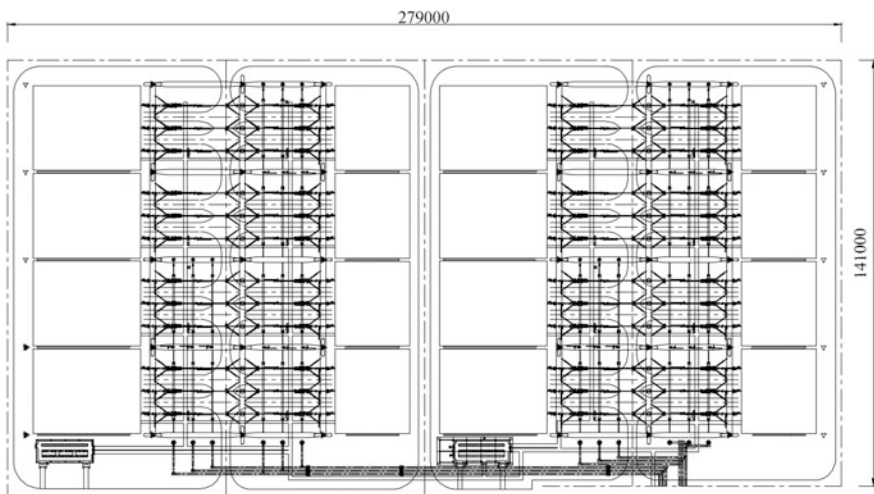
Typical improved checkerboard-pattern layout plan (mm)
